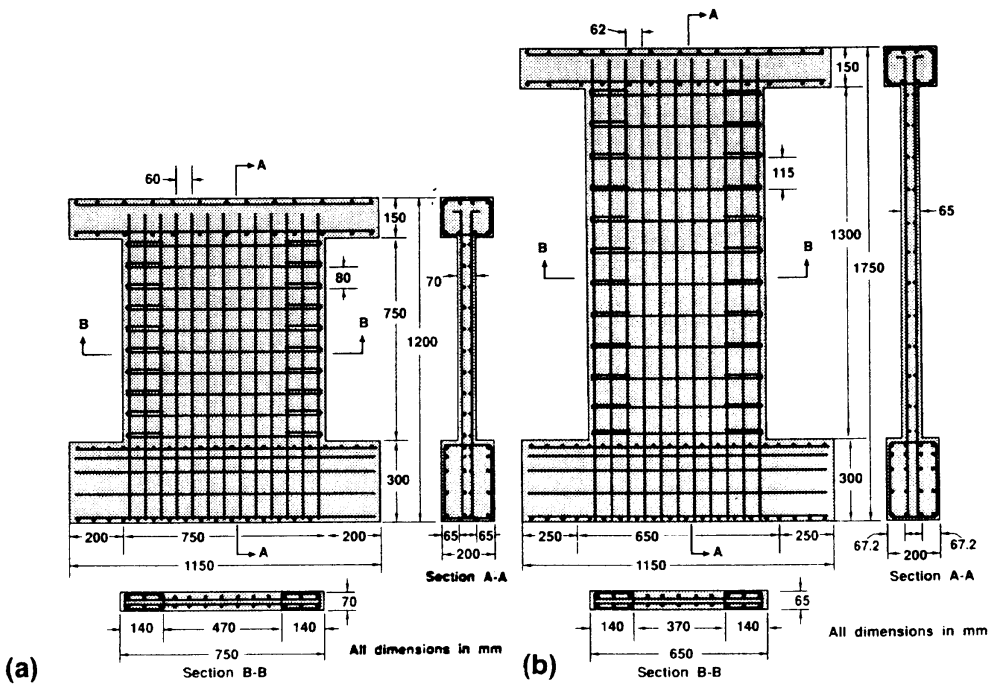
Details of Shear Walls Tested by Lefas et al. (1990); (a) Type-I Walls; (b) Type-II Walls
